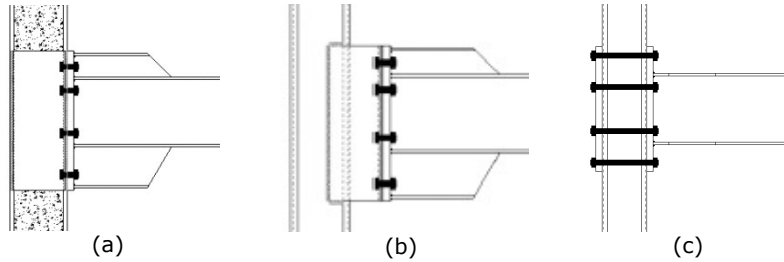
Bolted beam-to-column joint configurations (Univ. Liege) [3]
